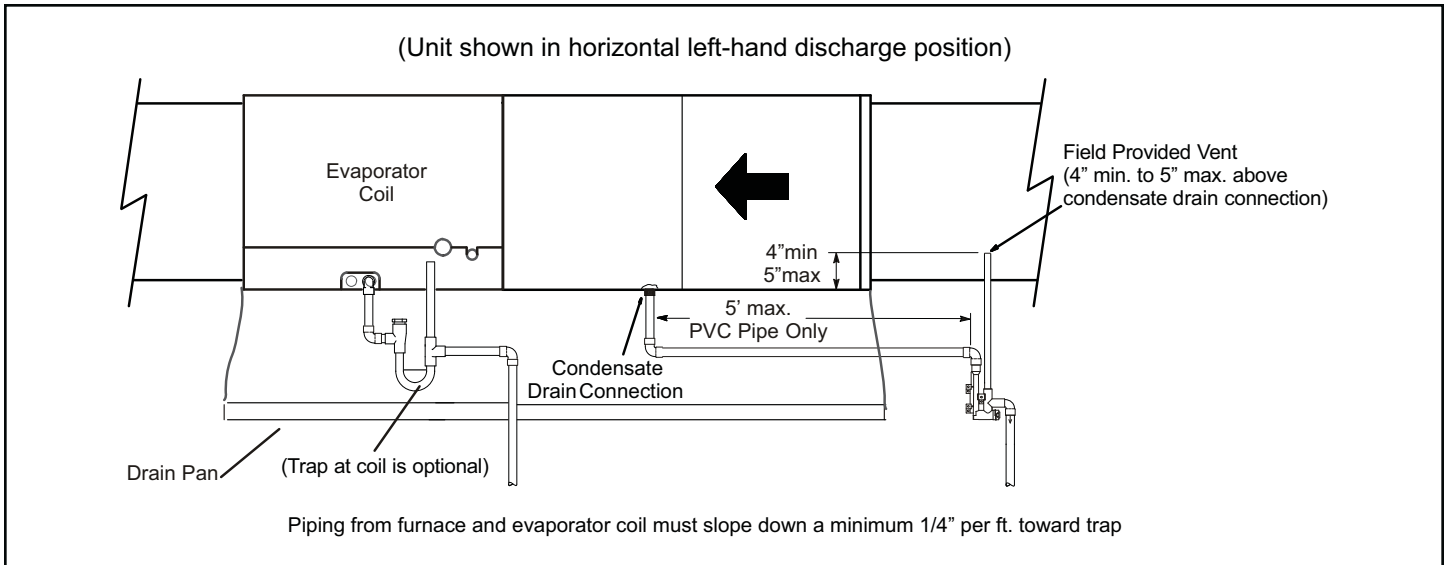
Furnace with Evaporator Coil Using a Separate Drain
